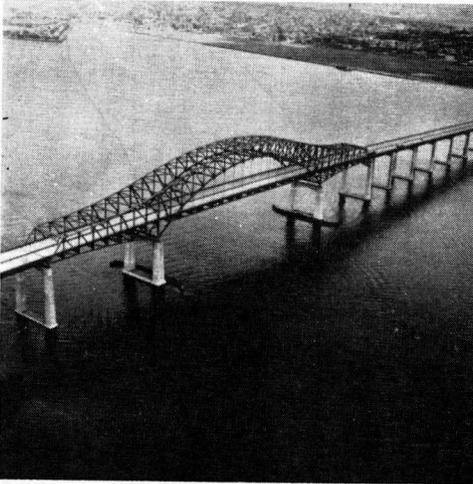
New Jersey Turnpike Bridge over Newark Bay.
